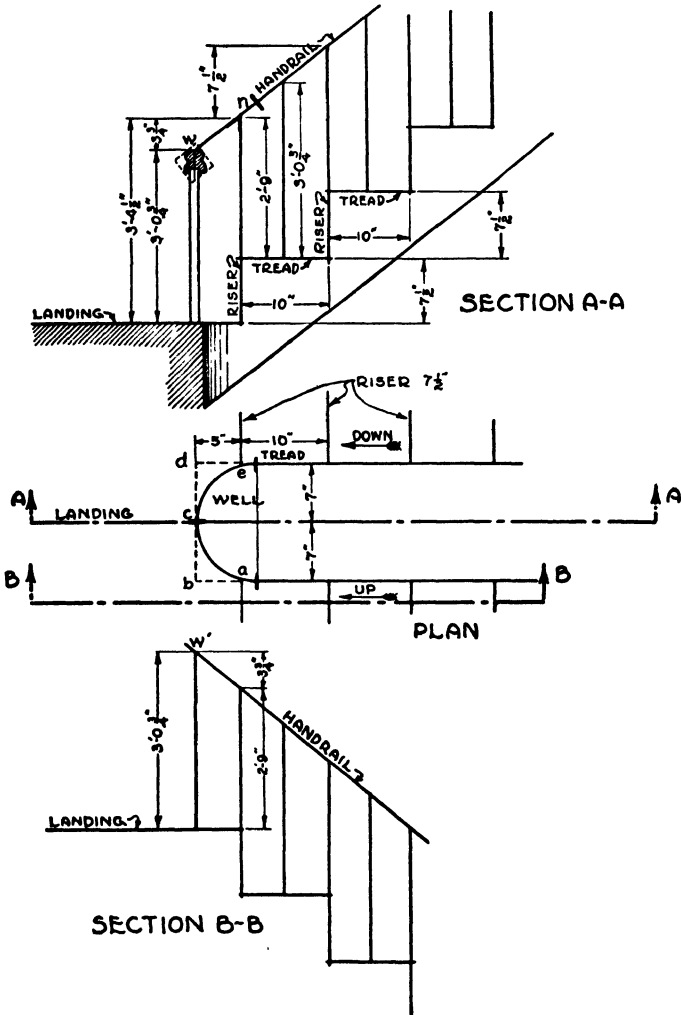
Plan and Sections of Geometrical Stair with Wellhole Wider than the Tread Width
